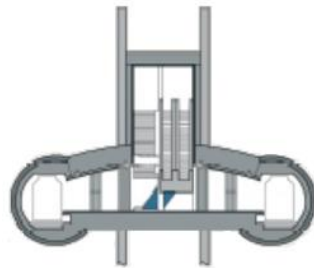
Cross section cross passage (2a) or entire station (2b)
